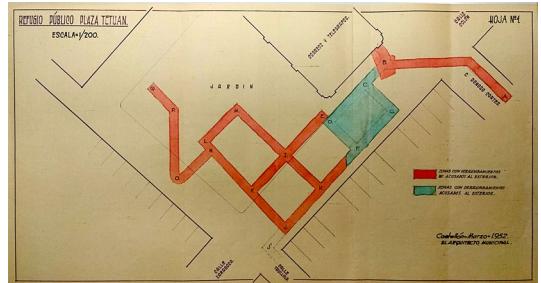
Shelter beneath Plaza Tetuán. Floor plan and sections, AHMC (Note 1) 1952, Municipal architect, Plan, 1/200, 54.9 x 29.2 cm, paper, black ink, cyan, and red
